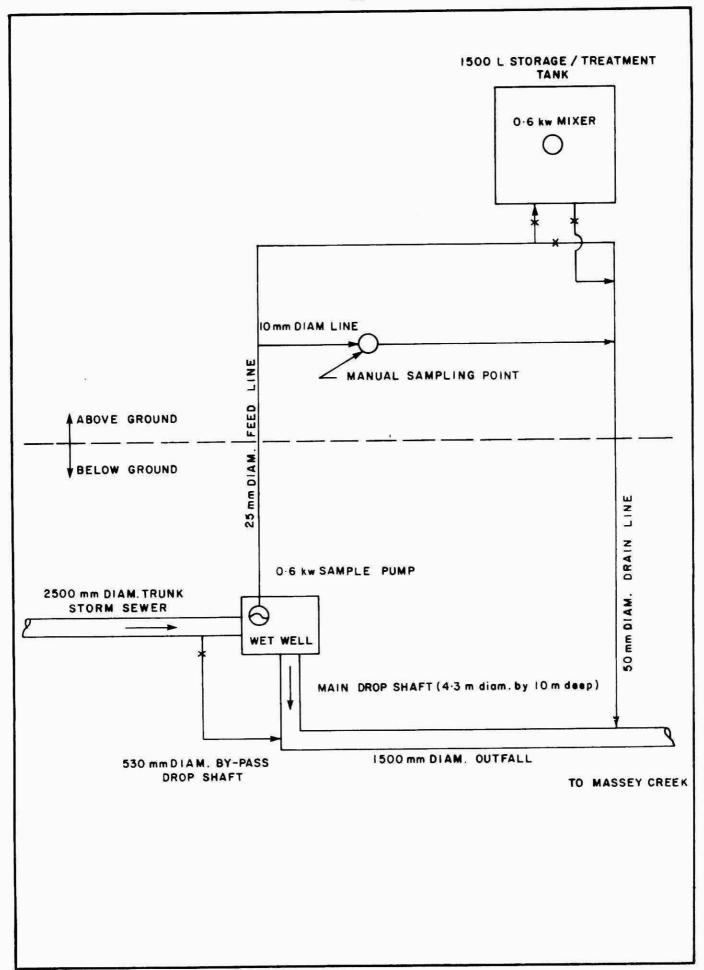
SCHEMATIC OF STORM SEWER AND EQUIPMENT USED
